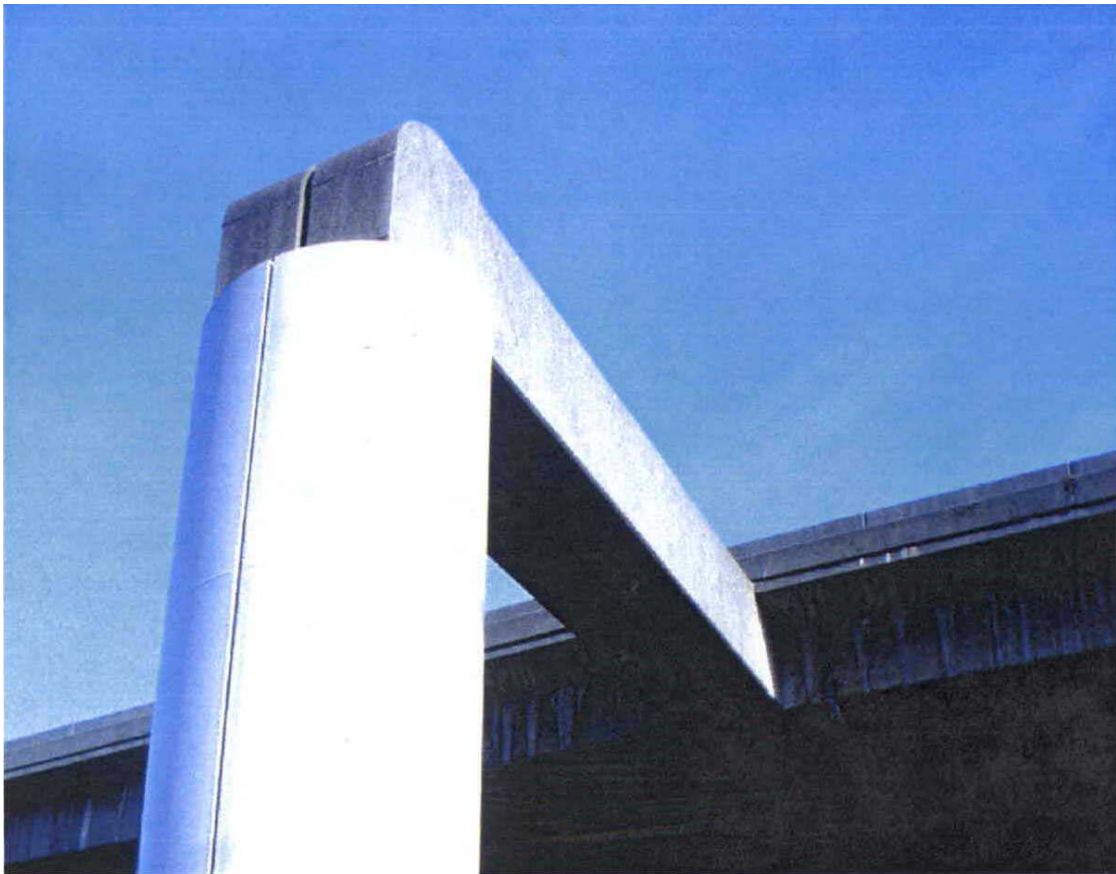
Retrofitted Split Columns in the SR 99 Spokane Street Overcrossing
